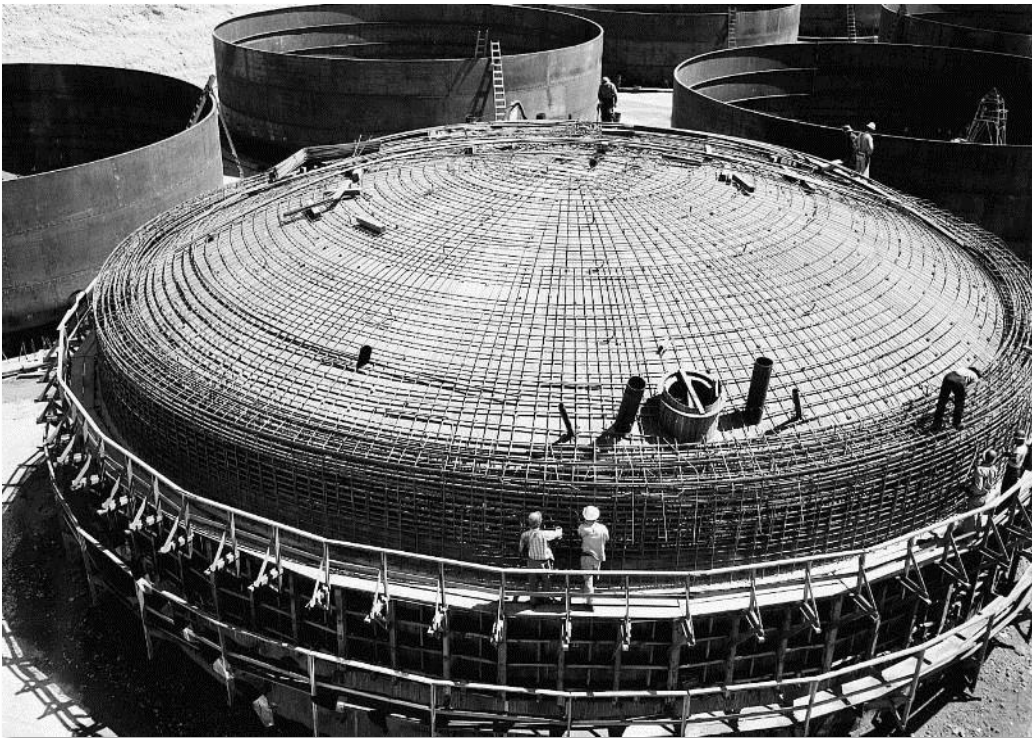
Placement of Dome Reinforcing Steel (RPP-PLAN-61510)
